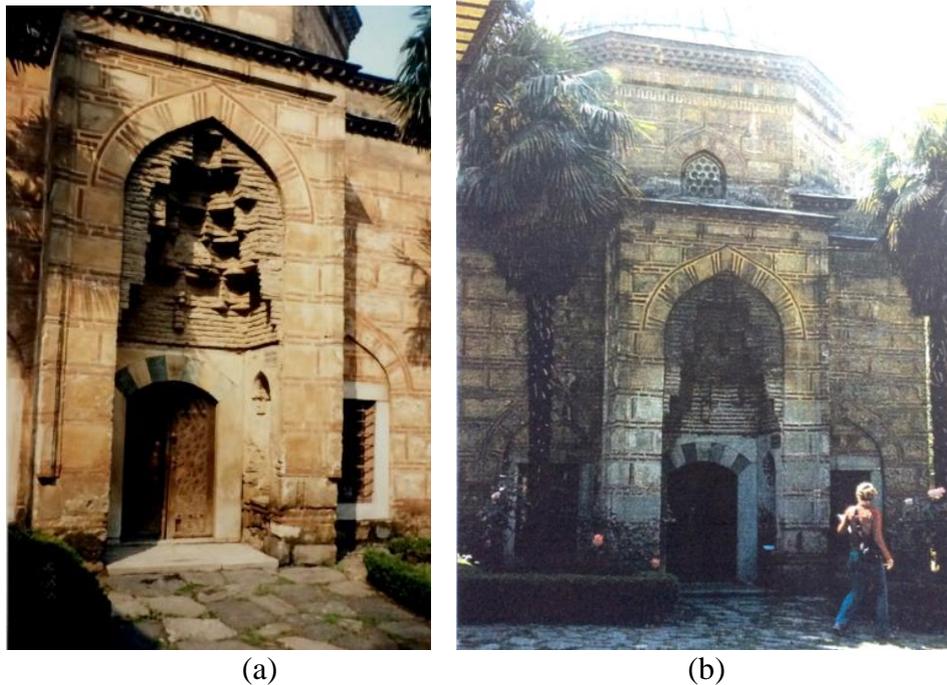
The photo showing spalled plaster, blackening and deformed lead sheets over the eaves.
